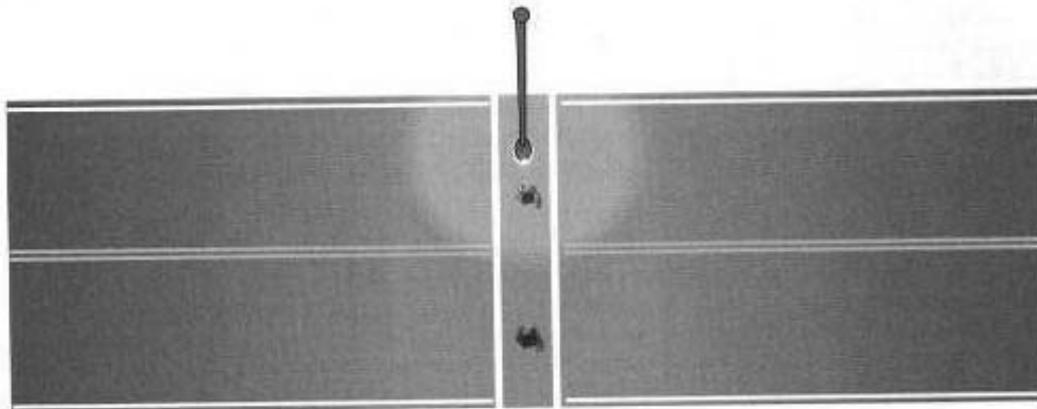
Drawing. Traditional midblock crosswalk lighting layout.
